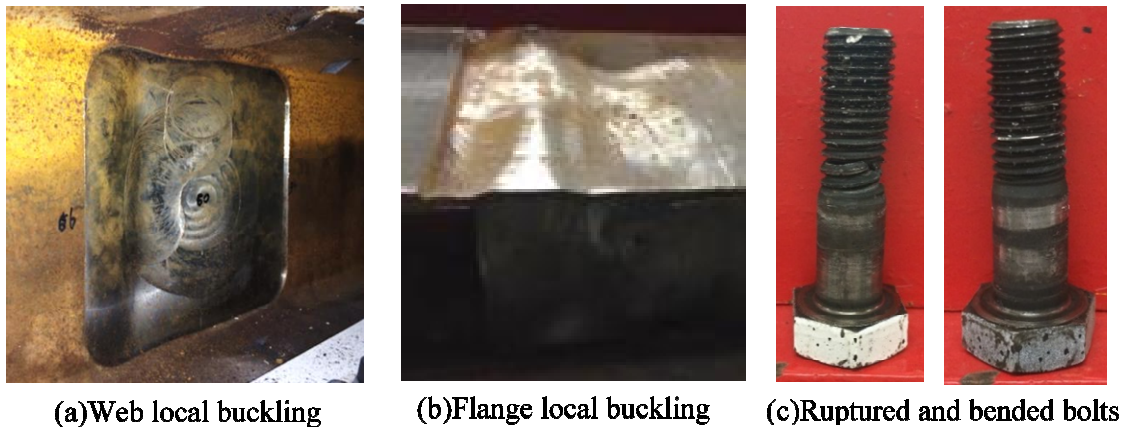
Buckled flange and web and damaged bolts of Pile 40/60-S
